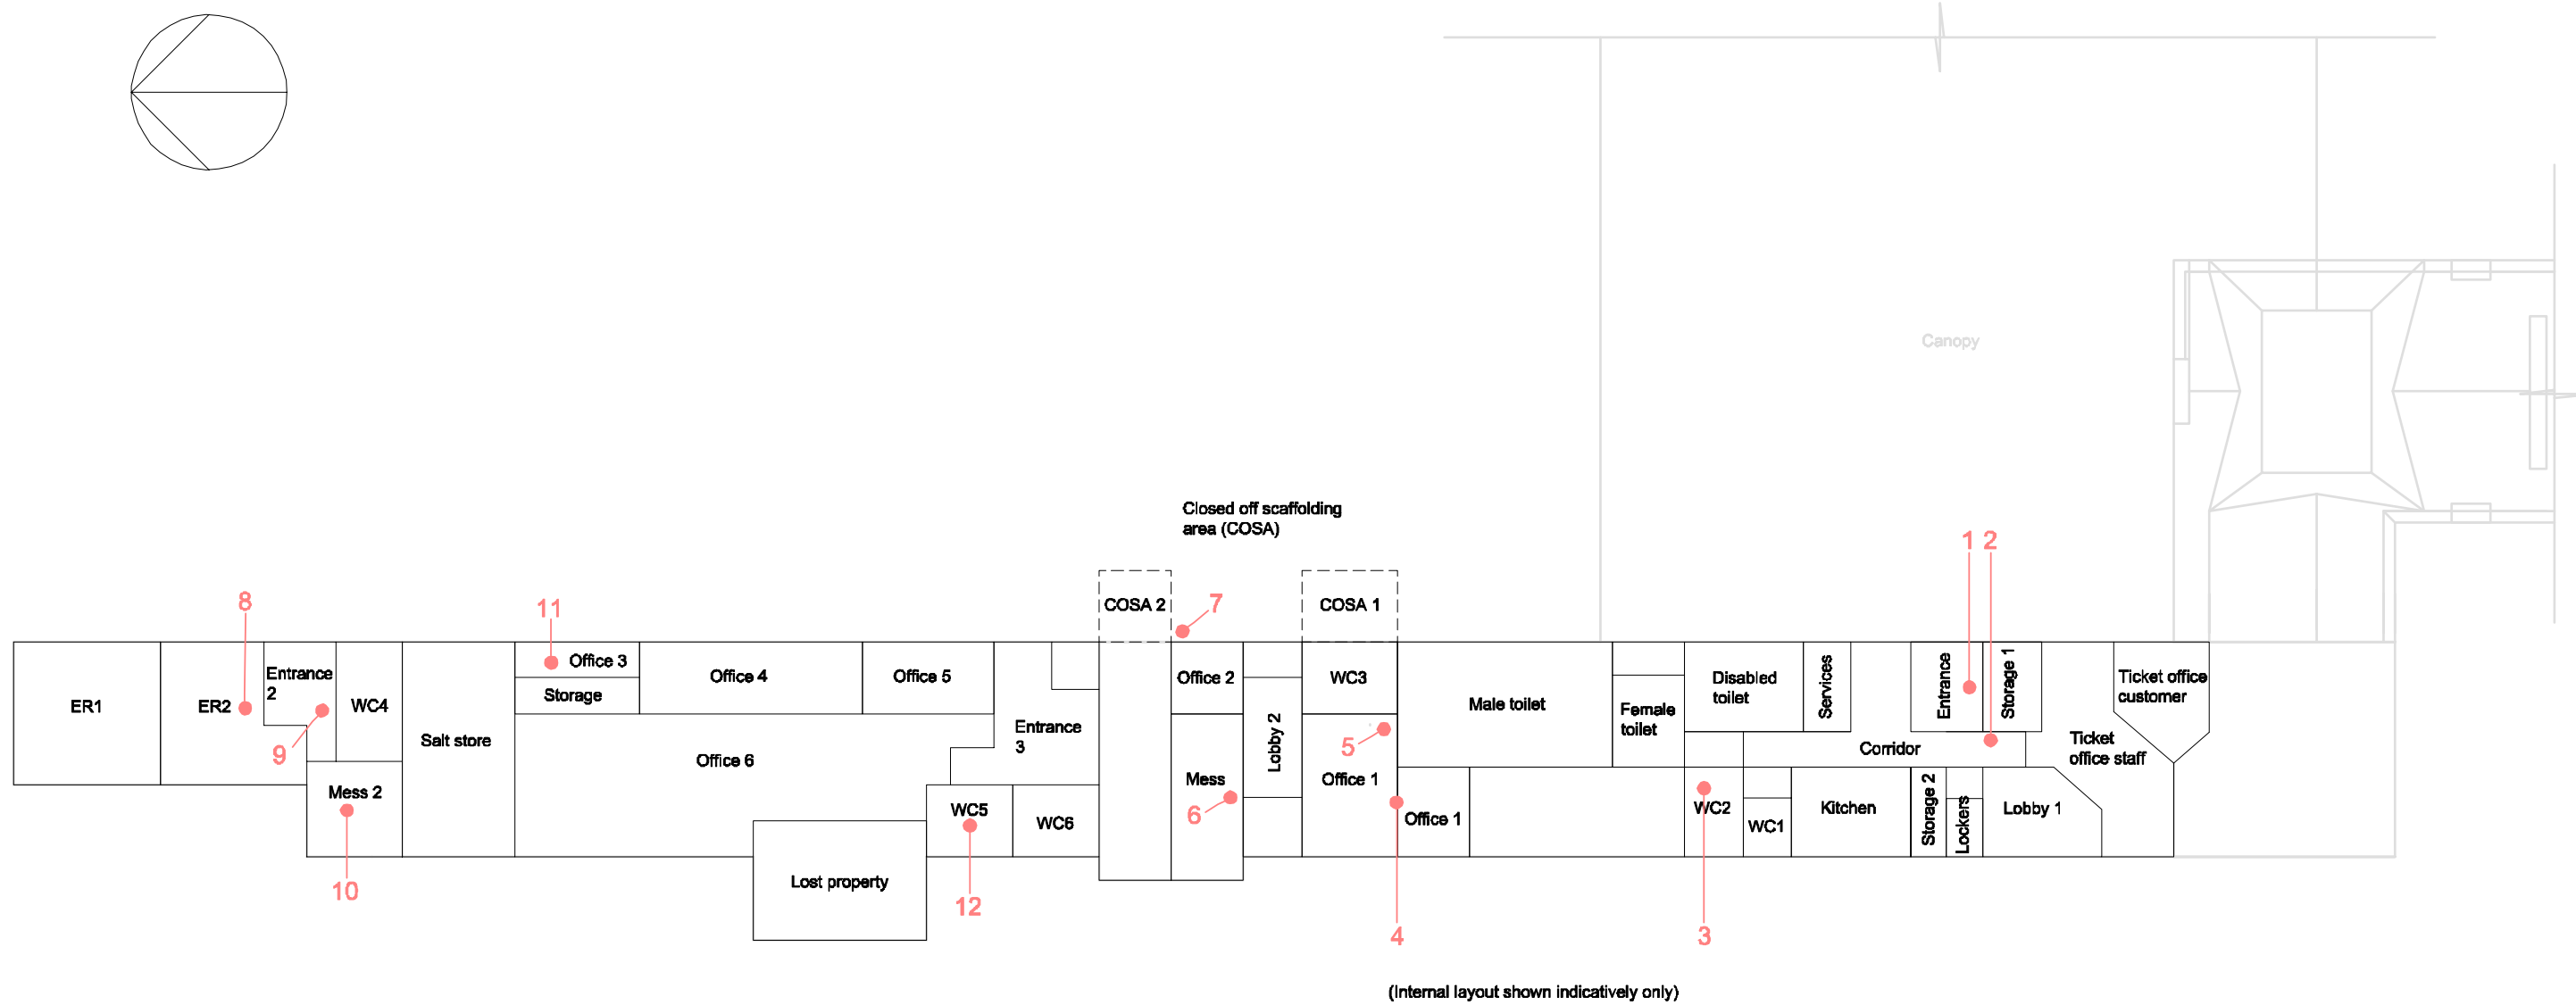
North Block Ground Level Plan of Station Hotel Building showing Defect/Observation Locations
